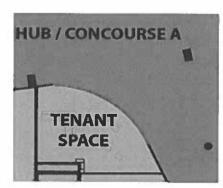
TENANT SPACE - CONCOURSE A - PLAN
